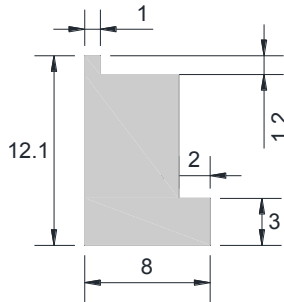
Cross section of the crown wall for a double-layer cube armored breakwater.
